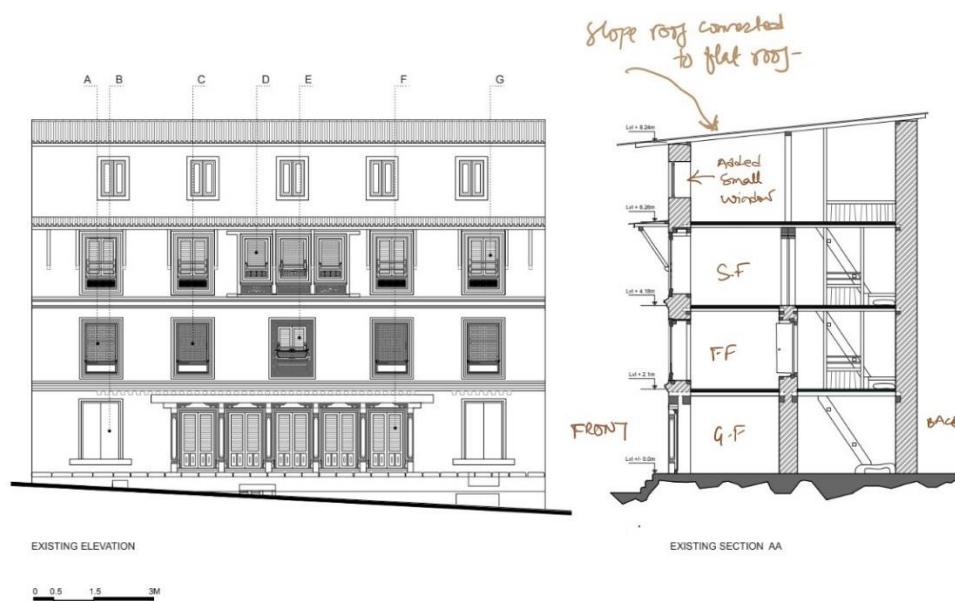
Elevation and section of observed changes in roof and attic wall in the traditional building.
